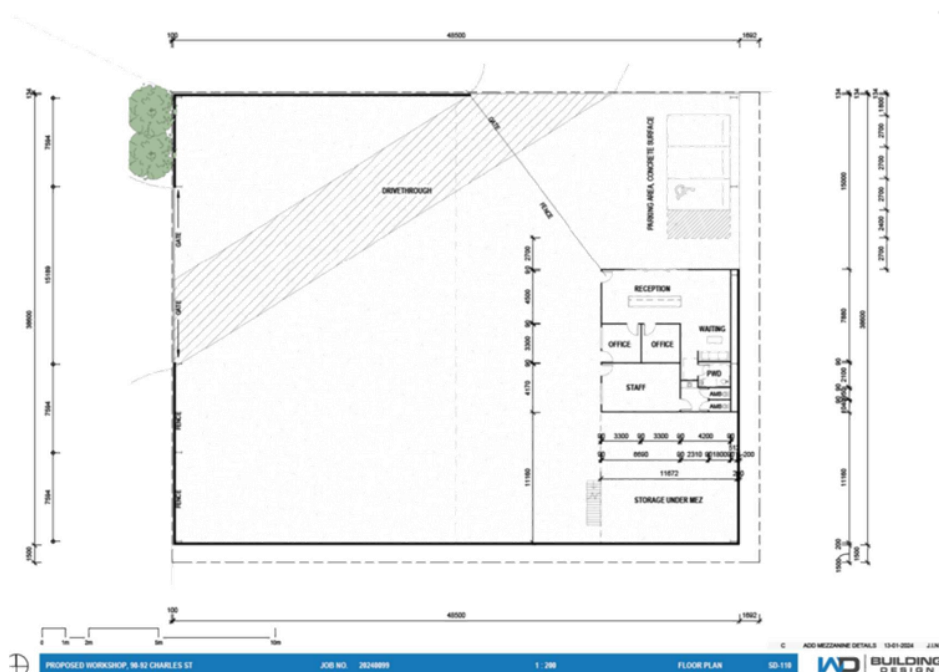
Proposed Floor Plan (Source: WD Building Design)
